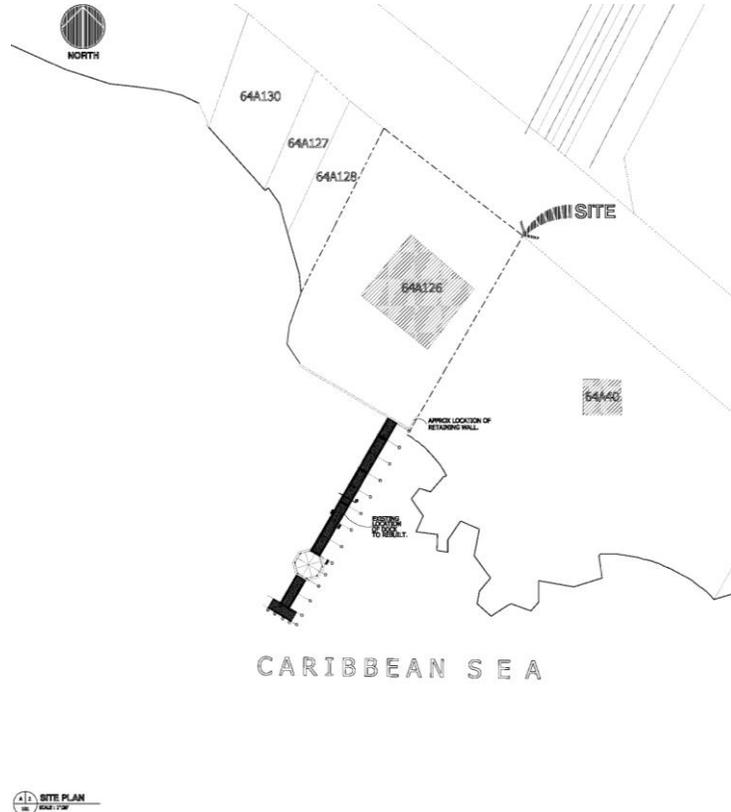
PLAN EXTRACT SHOWING PROPOSED DOCK LOCATION (SOURCE: ISLAND DRAFTING FEBRUARY, 2021)
